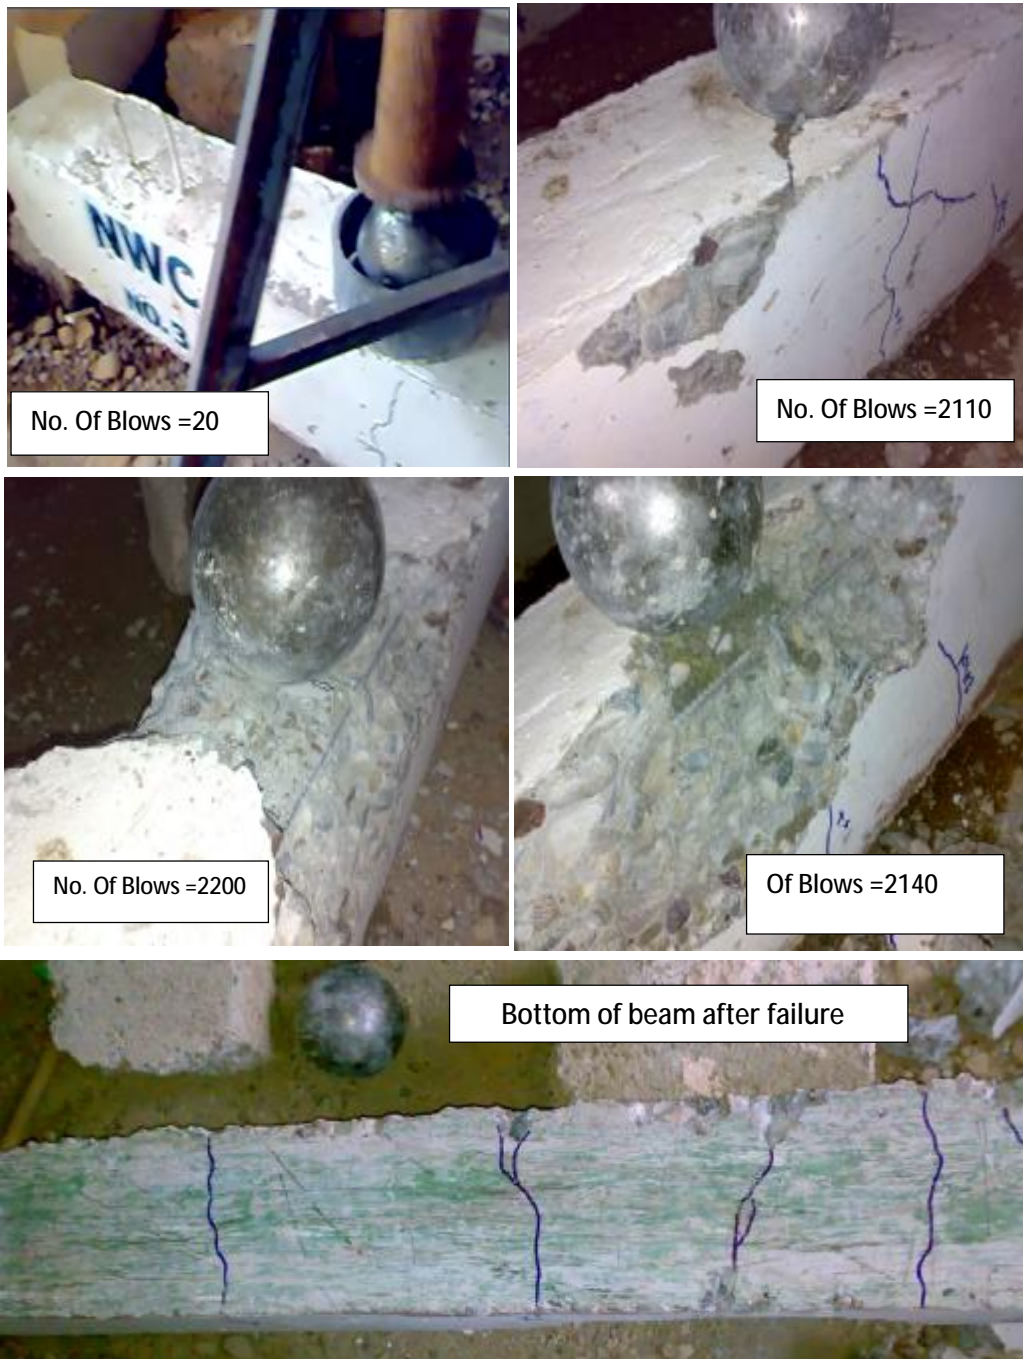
Number of blows from first creak up to failure for normalweight concrete w beam
